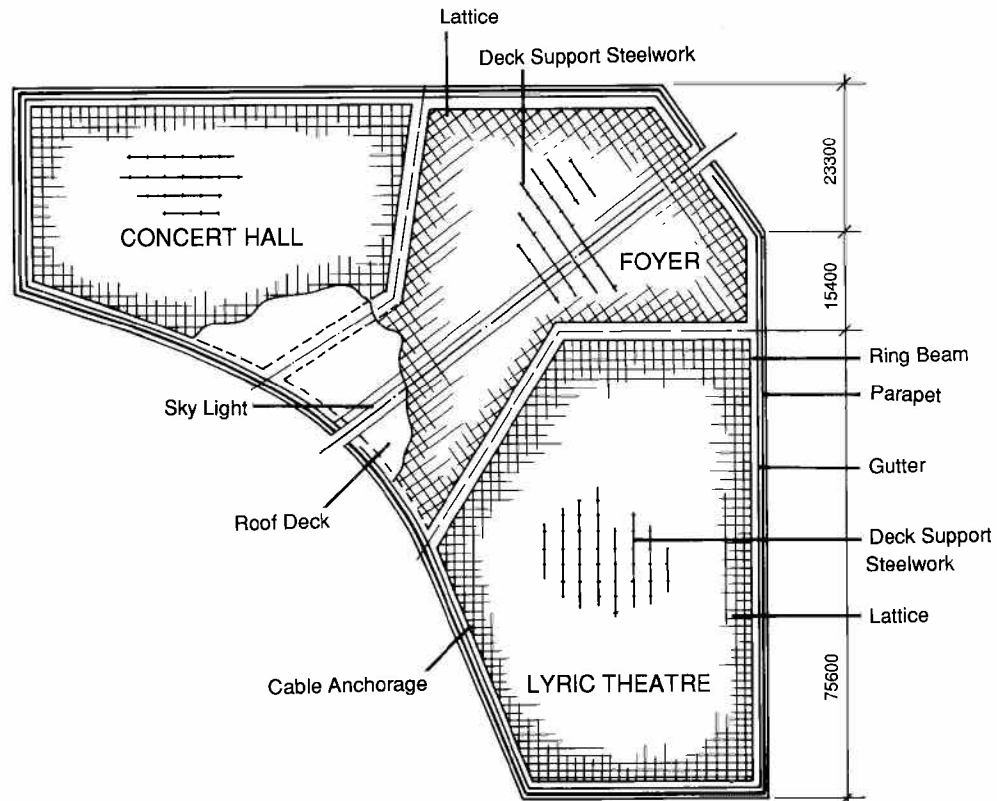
Roof plan with surface divided in two by linear skylight, overlying three distinct structural areas of complex
